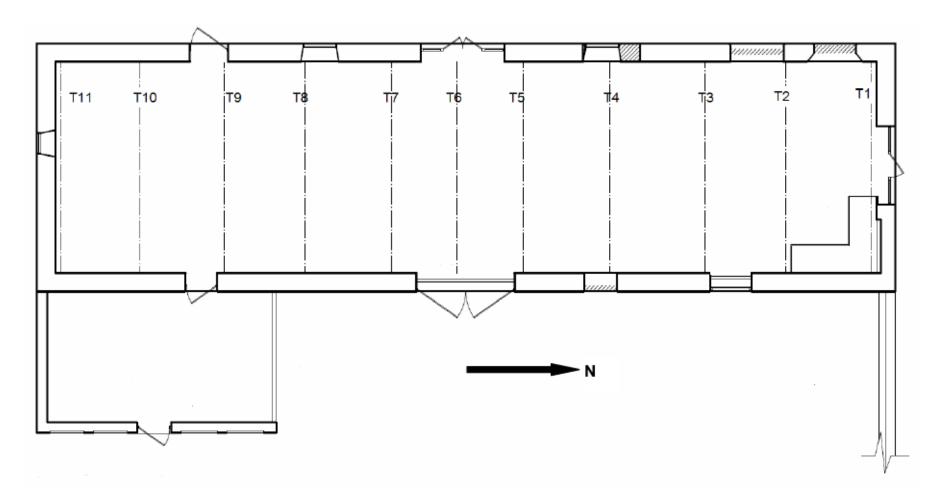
Ground-floor plan; showing truss locations (Wood and Stephen Design Management)
